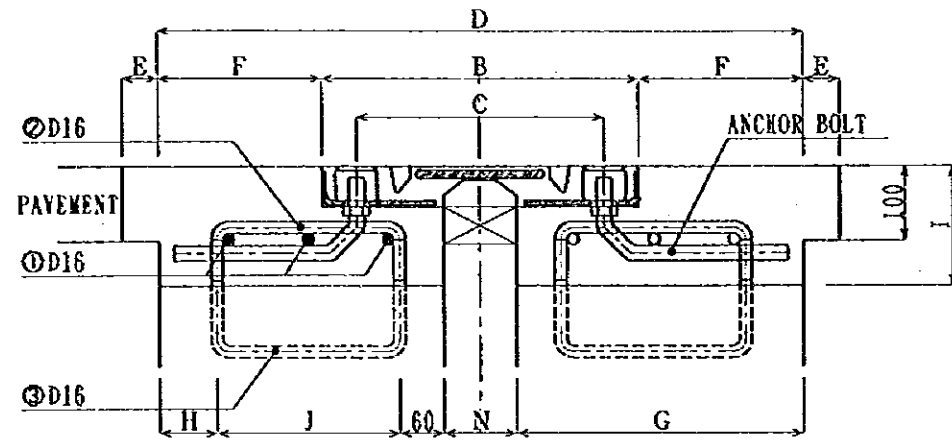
DETAIL OF SHOE AND ANCHOR BAR AT B-LINE
